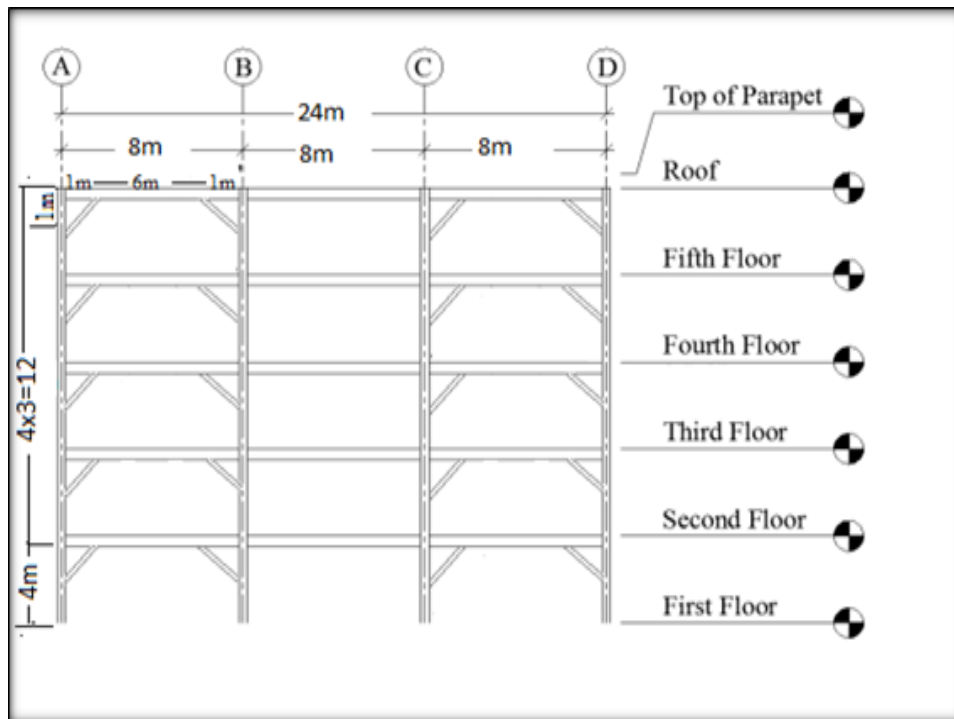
Schematic floor heights of the 5-storey steel framed structure (1-1 Section) (KBF)
